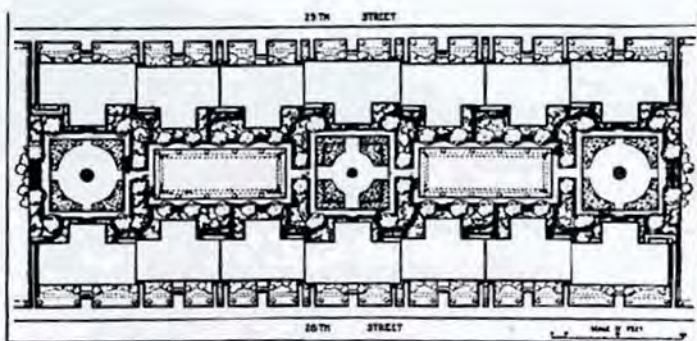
Cambridge Court. George H. Wells, 1918. Site plan.
